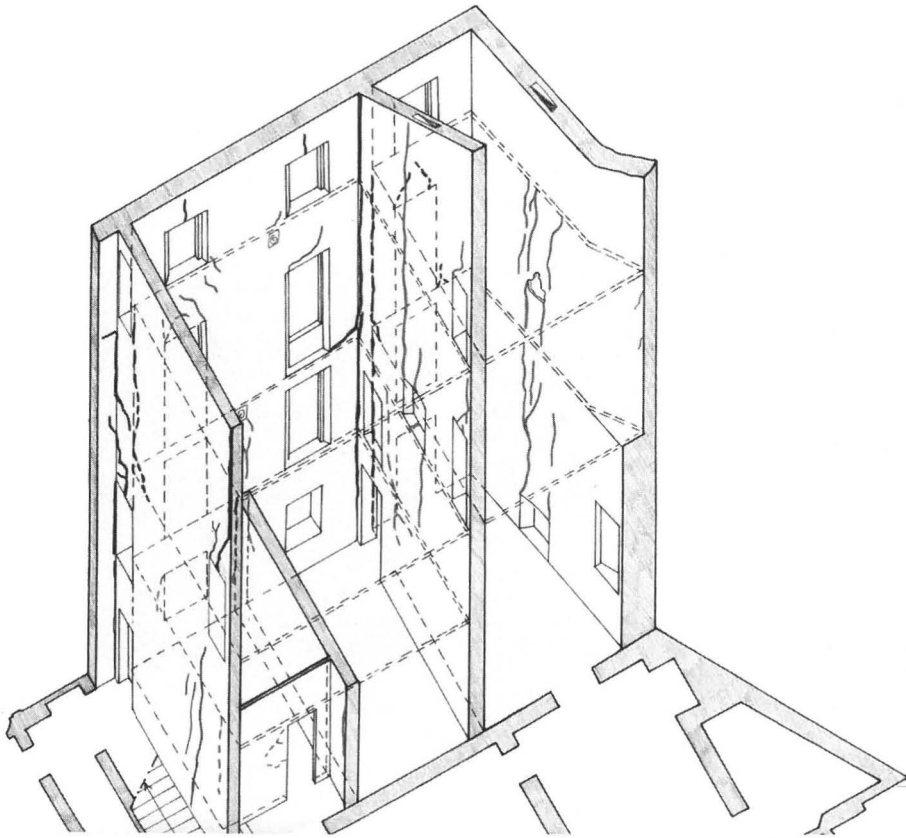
Detail of axonometric projection of the crack pattern with the crack running vertically the whole height between a transversal wall and the longitudinal North façade.
